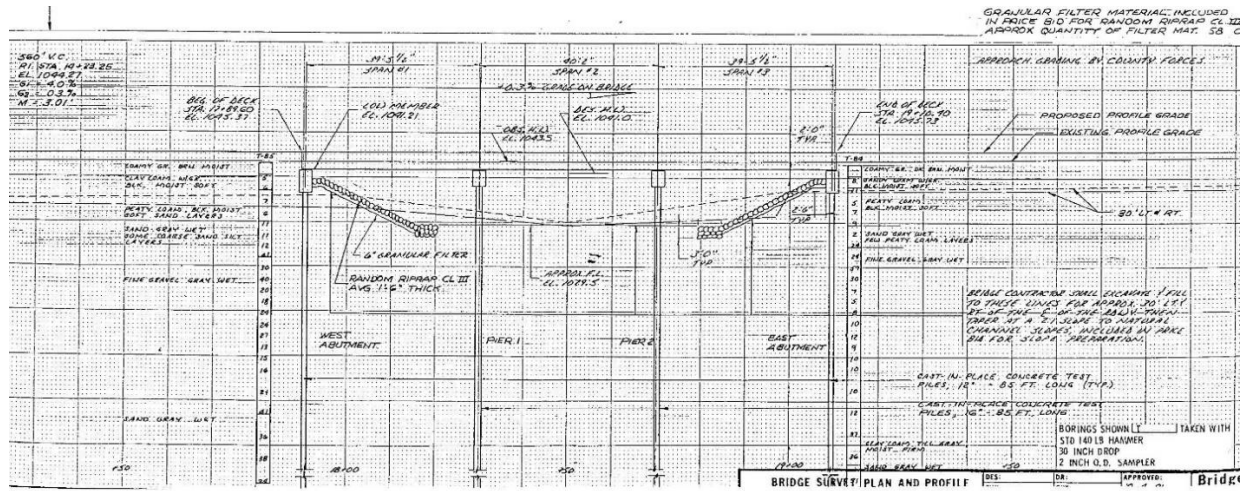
Profile plot of CR 22 over Pomme de Terre River from bridge plan
